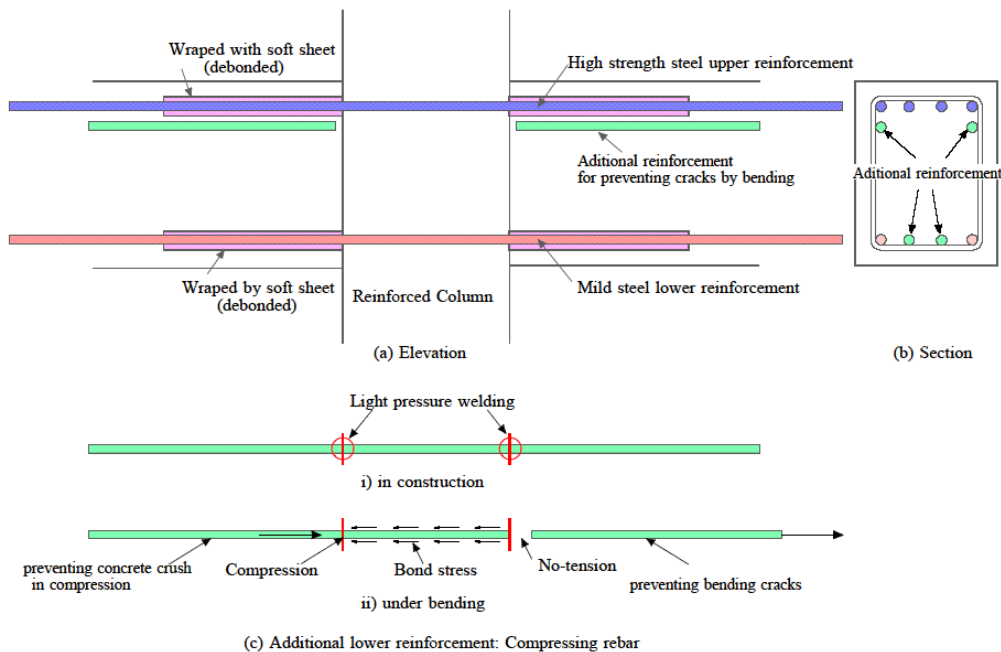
Reinforcement arrangement for beam-column connection producing re-centring potential
